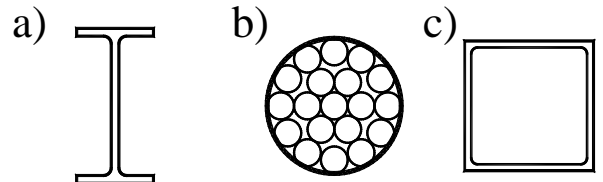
Cross-section types. a) – cross-section type of top chord, b) – cross-section type of bottom chord, c) – cross-section type of struts
